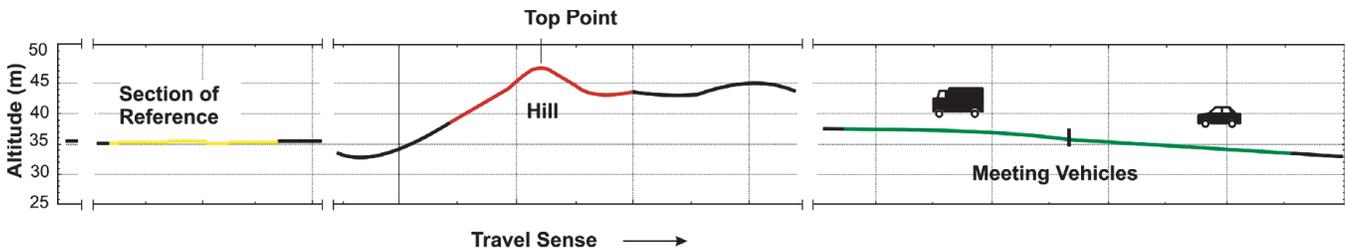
Profile of reconstructed road with three sections studied (not to scale).
